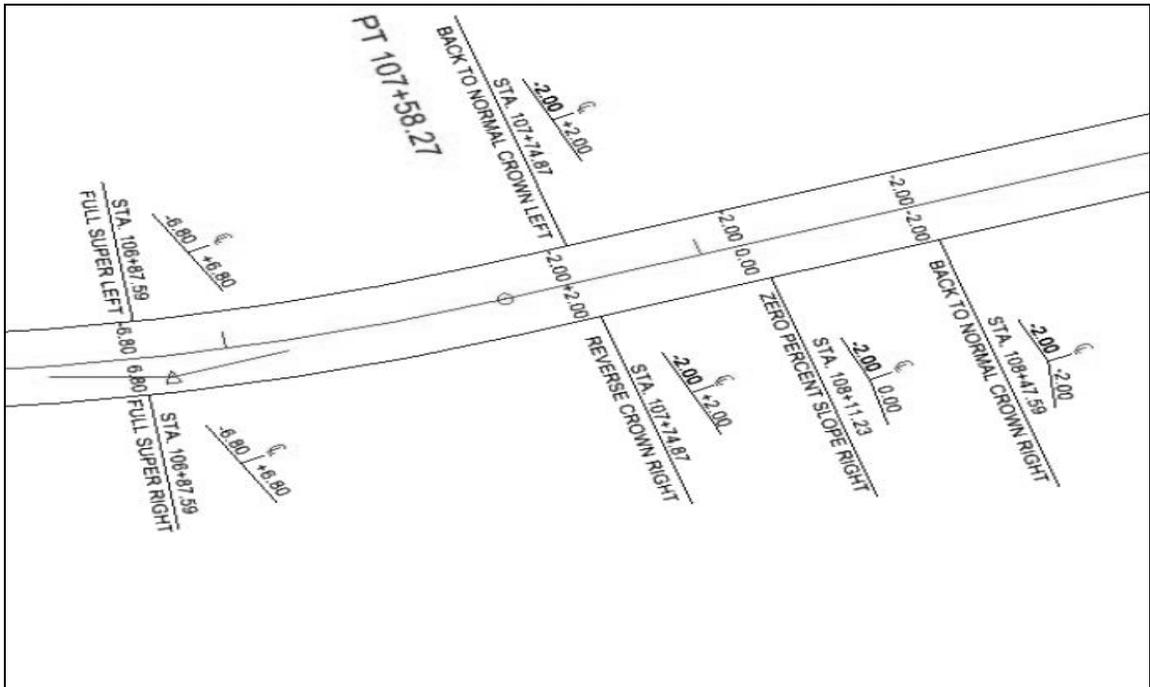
STATIONS AND CROSS SLOPES AFTER FULL SUPERELEVATION
